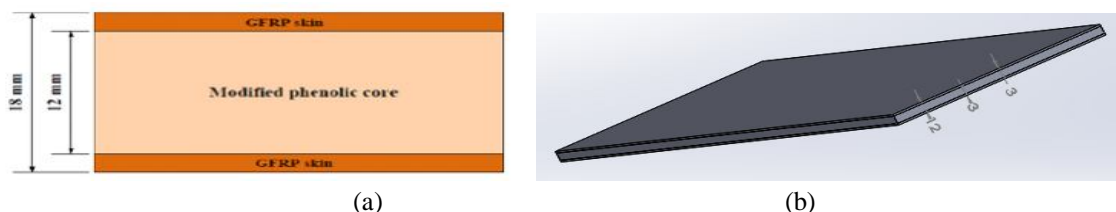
(a) GFRP sandwich slabs cross sections (b) Isometric View of Slab [14]
